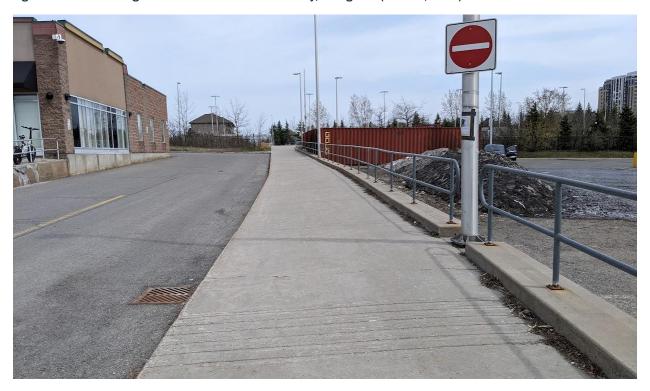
View of Transitway and Canadian Tire building from existing sidewalk, facing southeast (Parsons, 2023).
